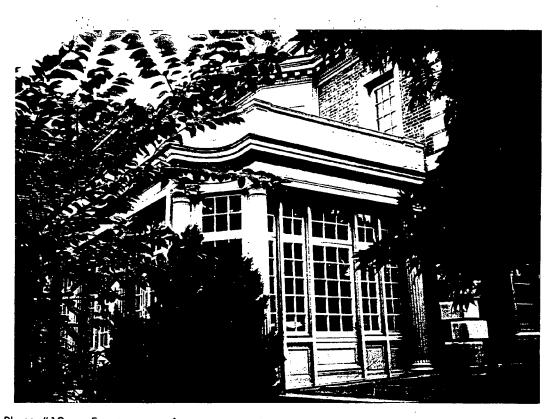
Exterior view of sun room window No.s 121 and 122. These sash will be restored and will receive exterior wood-framed storm glazing.
